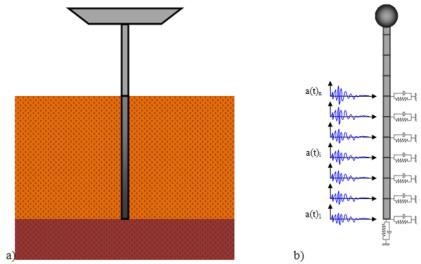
a) the realistic model of pile in the soil, bridge pier and soil, b) the numerical model of pile, bridge pier and implicit modelling of soil action [4]
